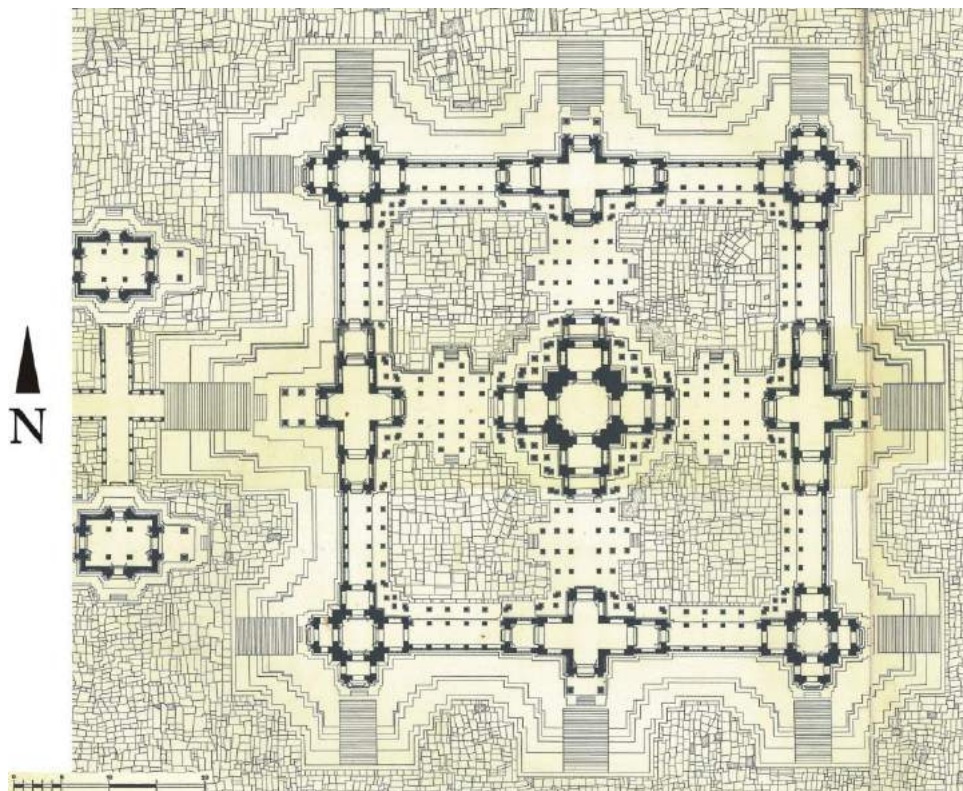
Plan of the 1st enclosure of Angkor Wat - note the real windows on the outside and the open colonnaded walkways on the inside (after Nafilyan 1969)
